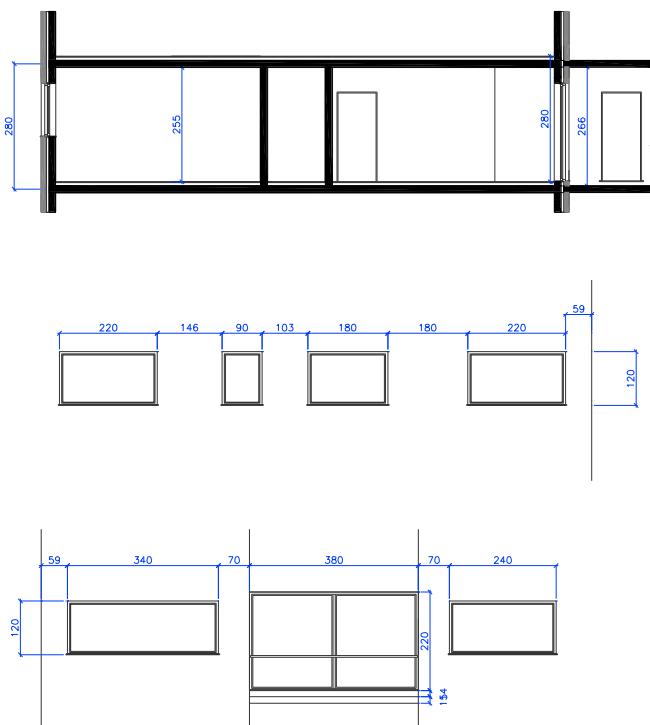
Apartment block / Office building: Section AA' (top), North elevation (middle) and South elevation (bottom) of a typical floor
